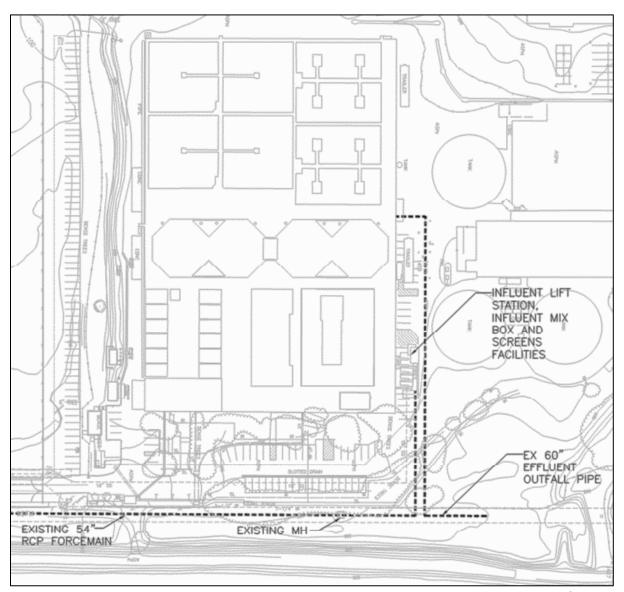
Existing SVCW Influent Conveyance Facilities Site Plan
